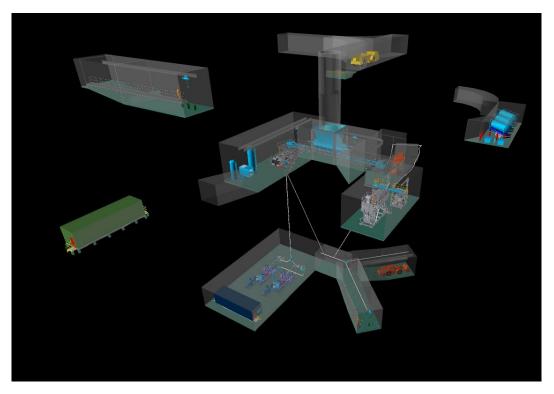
Underground Backfill Plant View from SE (without access drifts shown)
